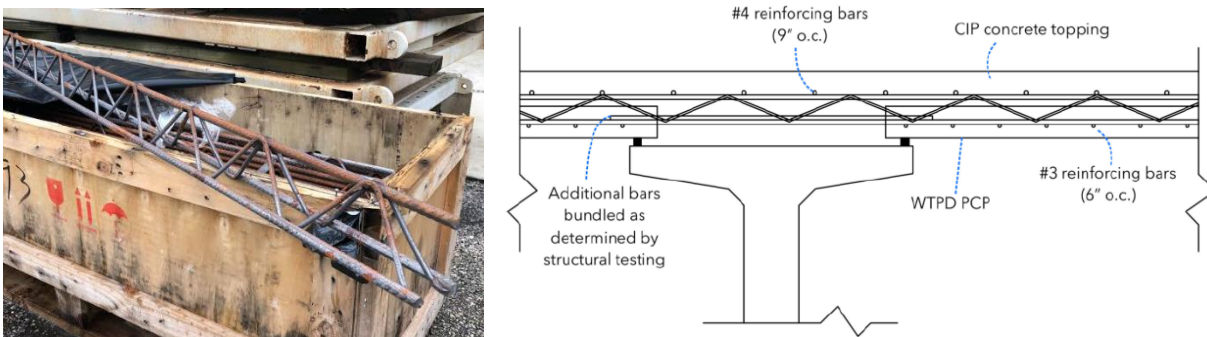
Wire trusses and typical design of NextGen decks with wire trusses
